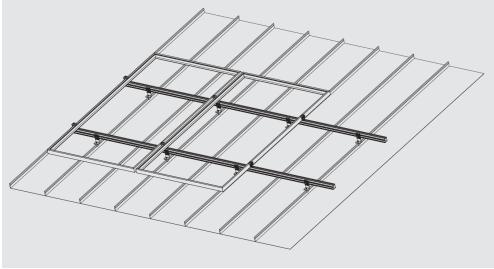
PV PANEL INSTALLATION ON THE ROOF FROM CORRUGATED METAL SHEET
